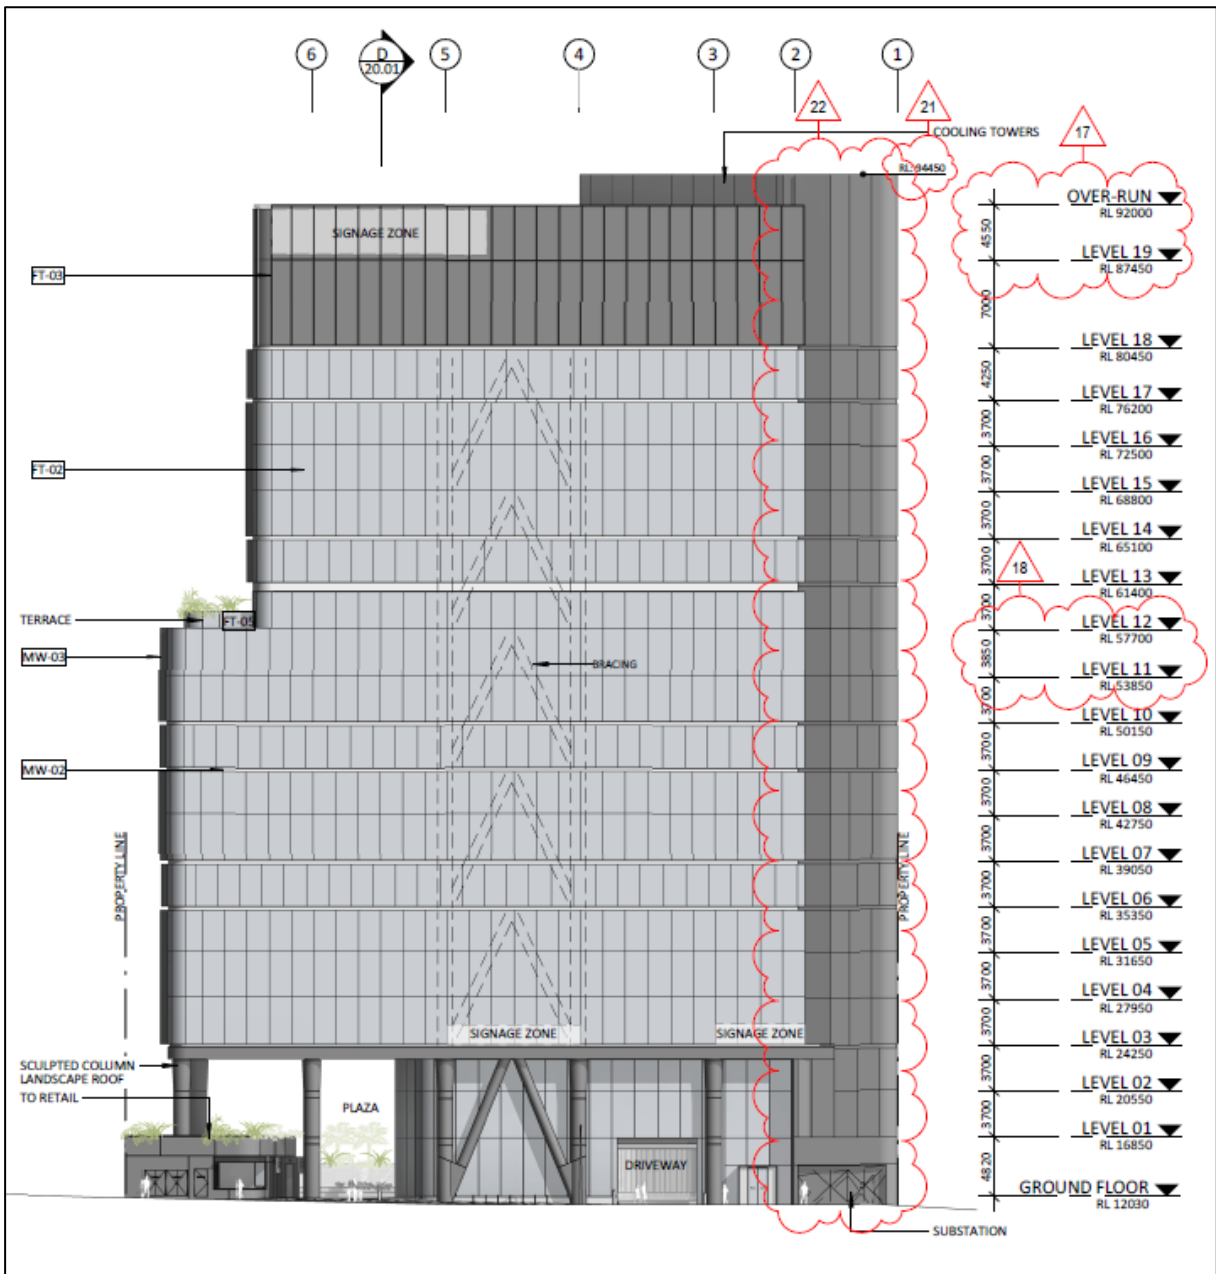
| South Elevation (viewed from Hassall Street) (Source: RtS)
